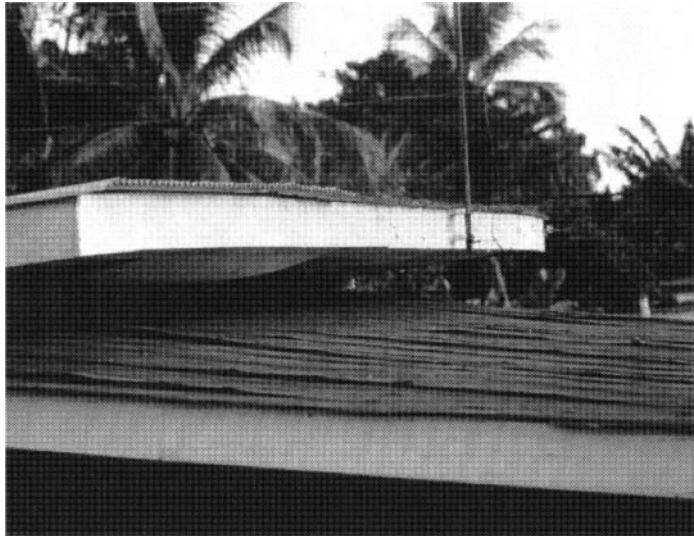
Example of a 1.2 m wide cantilever eave beyond the ridge line of a double-lean-to roof, Trinidad.
